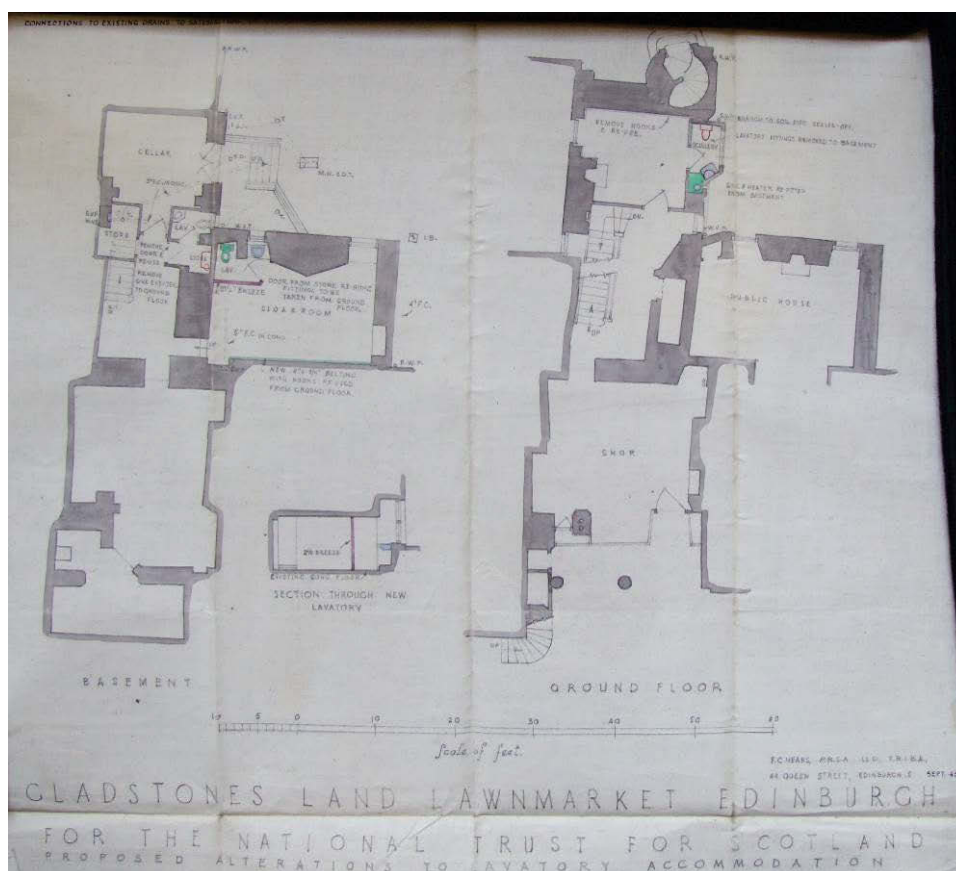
Plans and section showing basement and ground floors. Minor alterations warranted 16th November 1945. City of Edinburgh plan store
